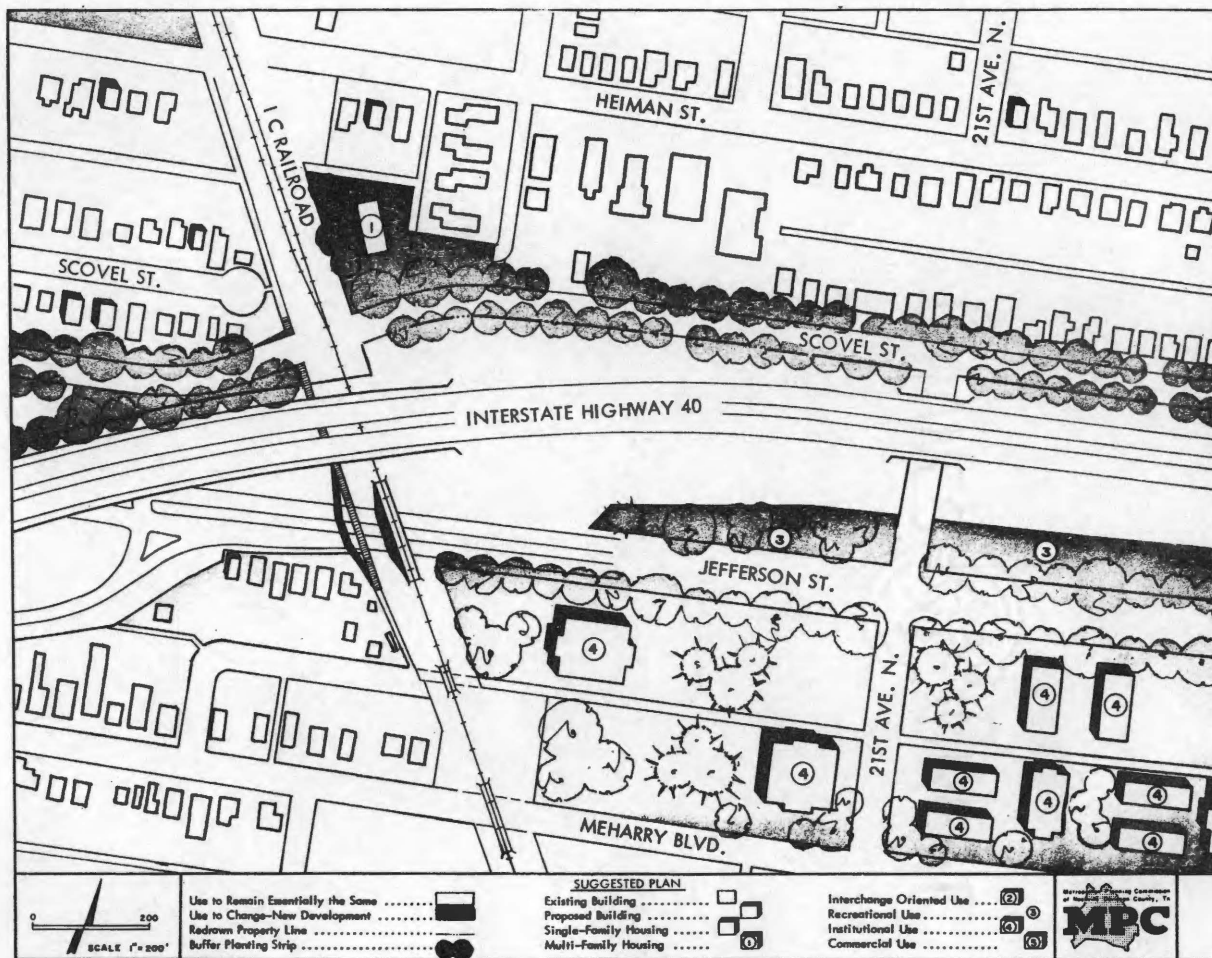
Railroad and pedestrian overpass -- apartment complex.
